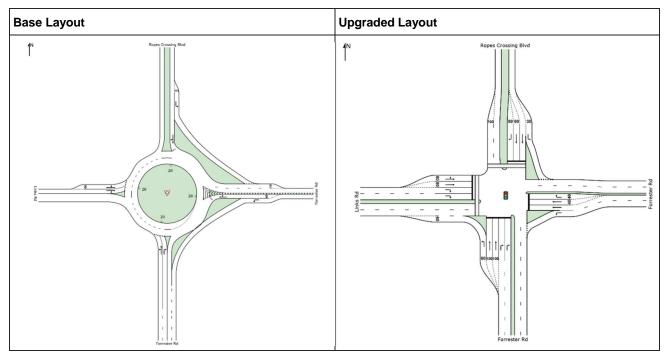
2021 with Links Road extension - Forrester Road/Ropes Crossing Boulevard/Links Road
